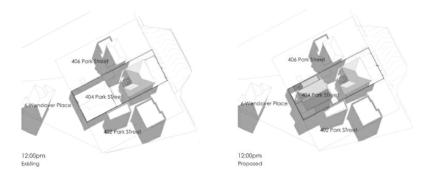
Shadowing 12 noon at 21st June (existing and proposed) (Oramatis, 2021)
